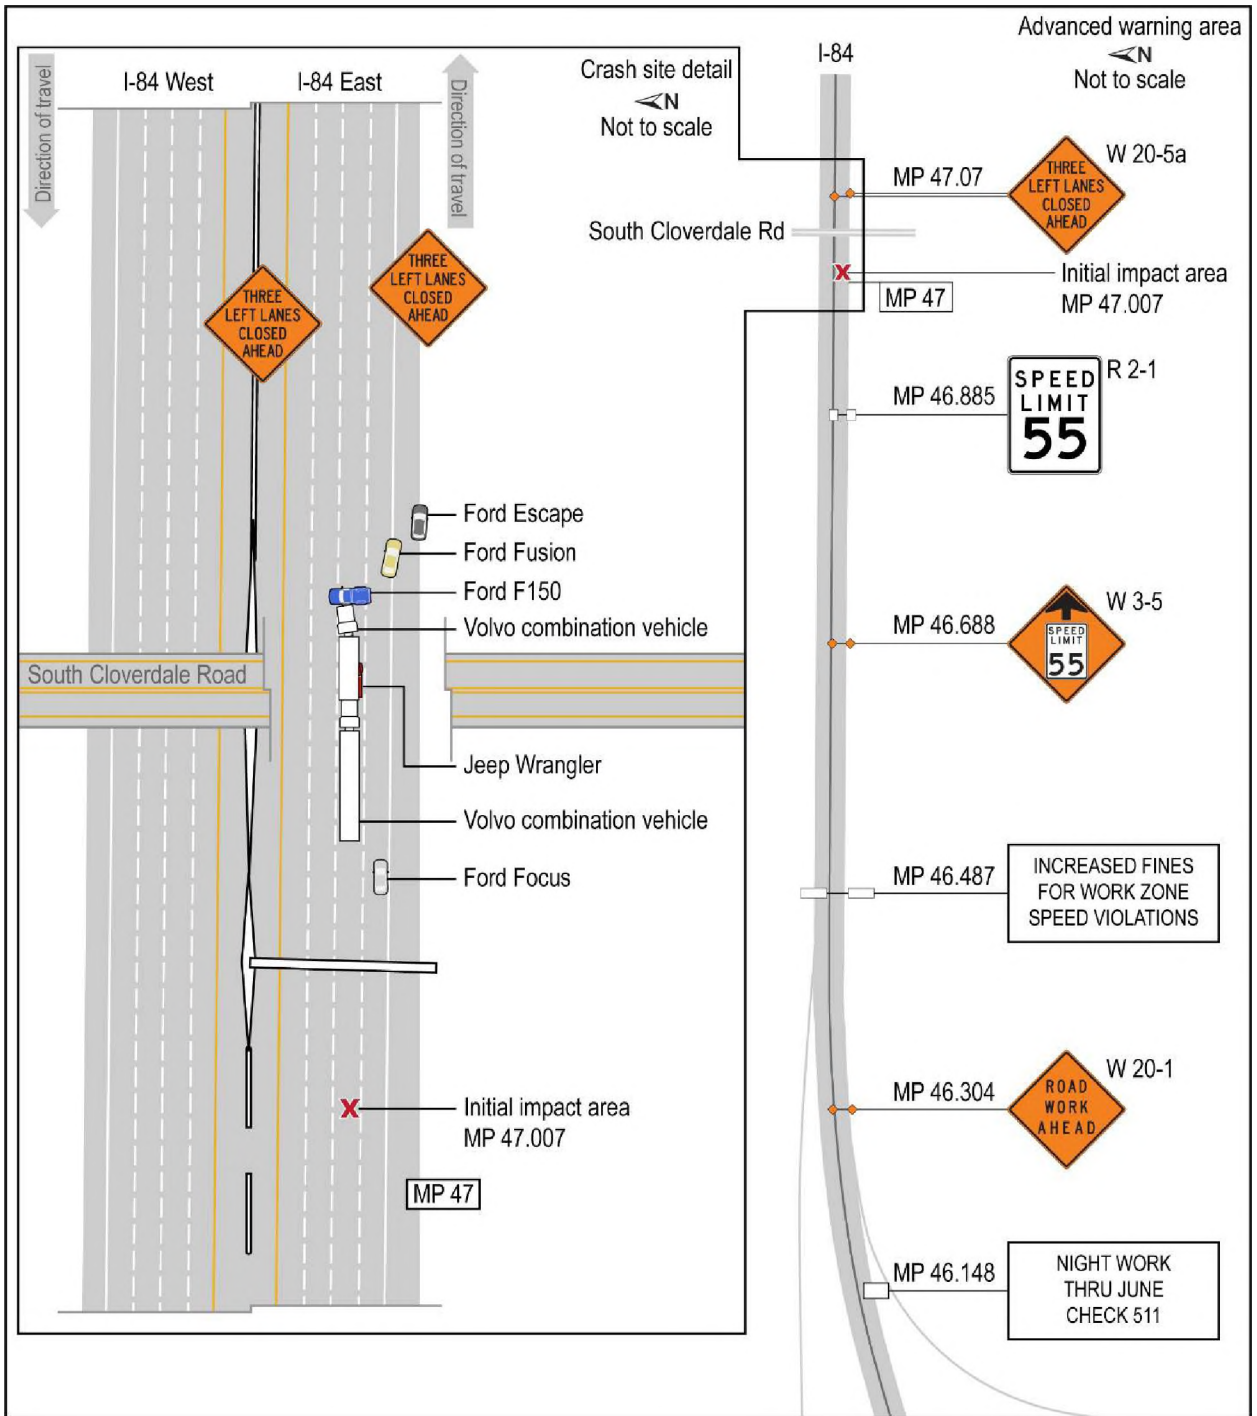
Advance Warning Area of Work Zone with Crash Site Detail
